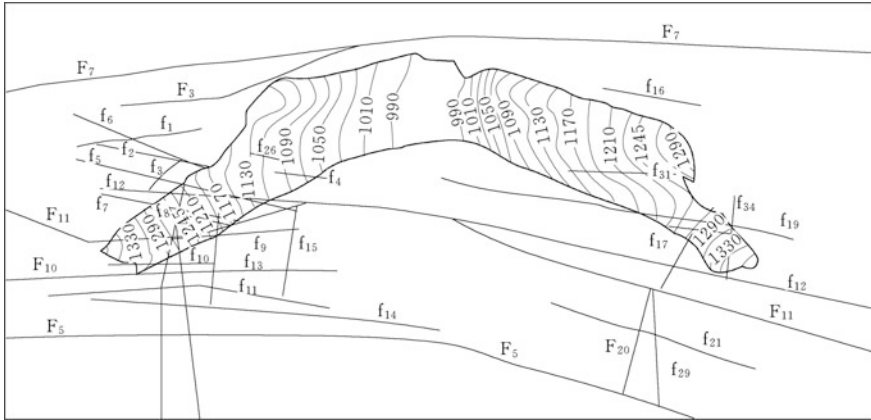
Plan showing excavation benches and faults: phase 1
